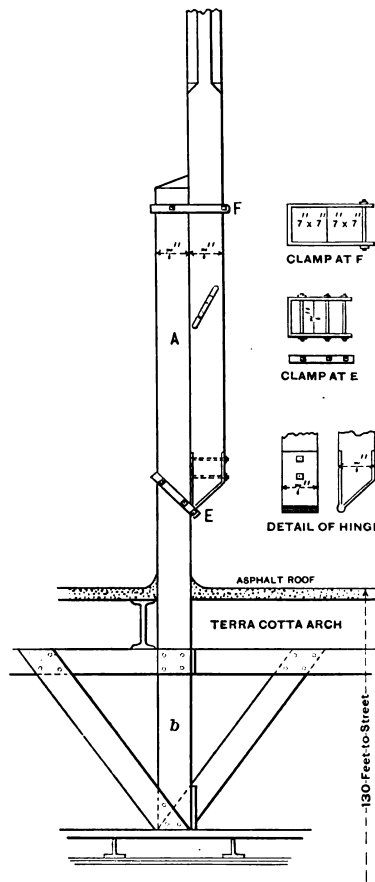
Detail, Showing Manner of Bracing Stanchions Under the Roof Beams.—Scale, 3/8 Inch to the Foot.
